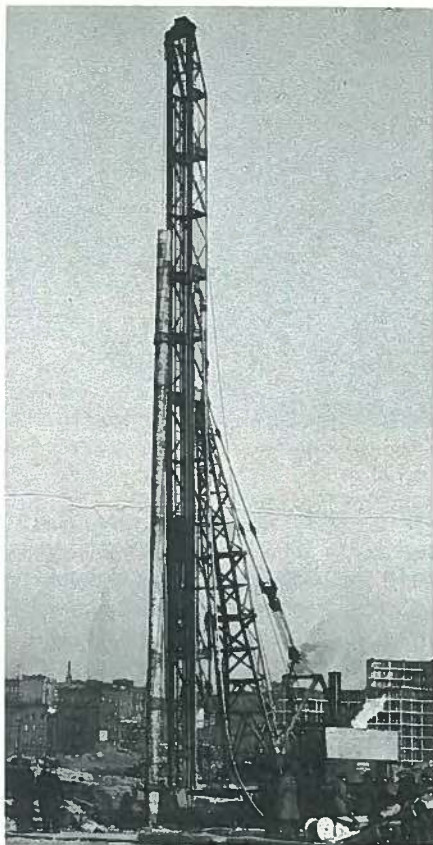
Experimental prestressed cylindrical pile being driven in 1948 in New York City by the Raymond Concrete Pile Company.
